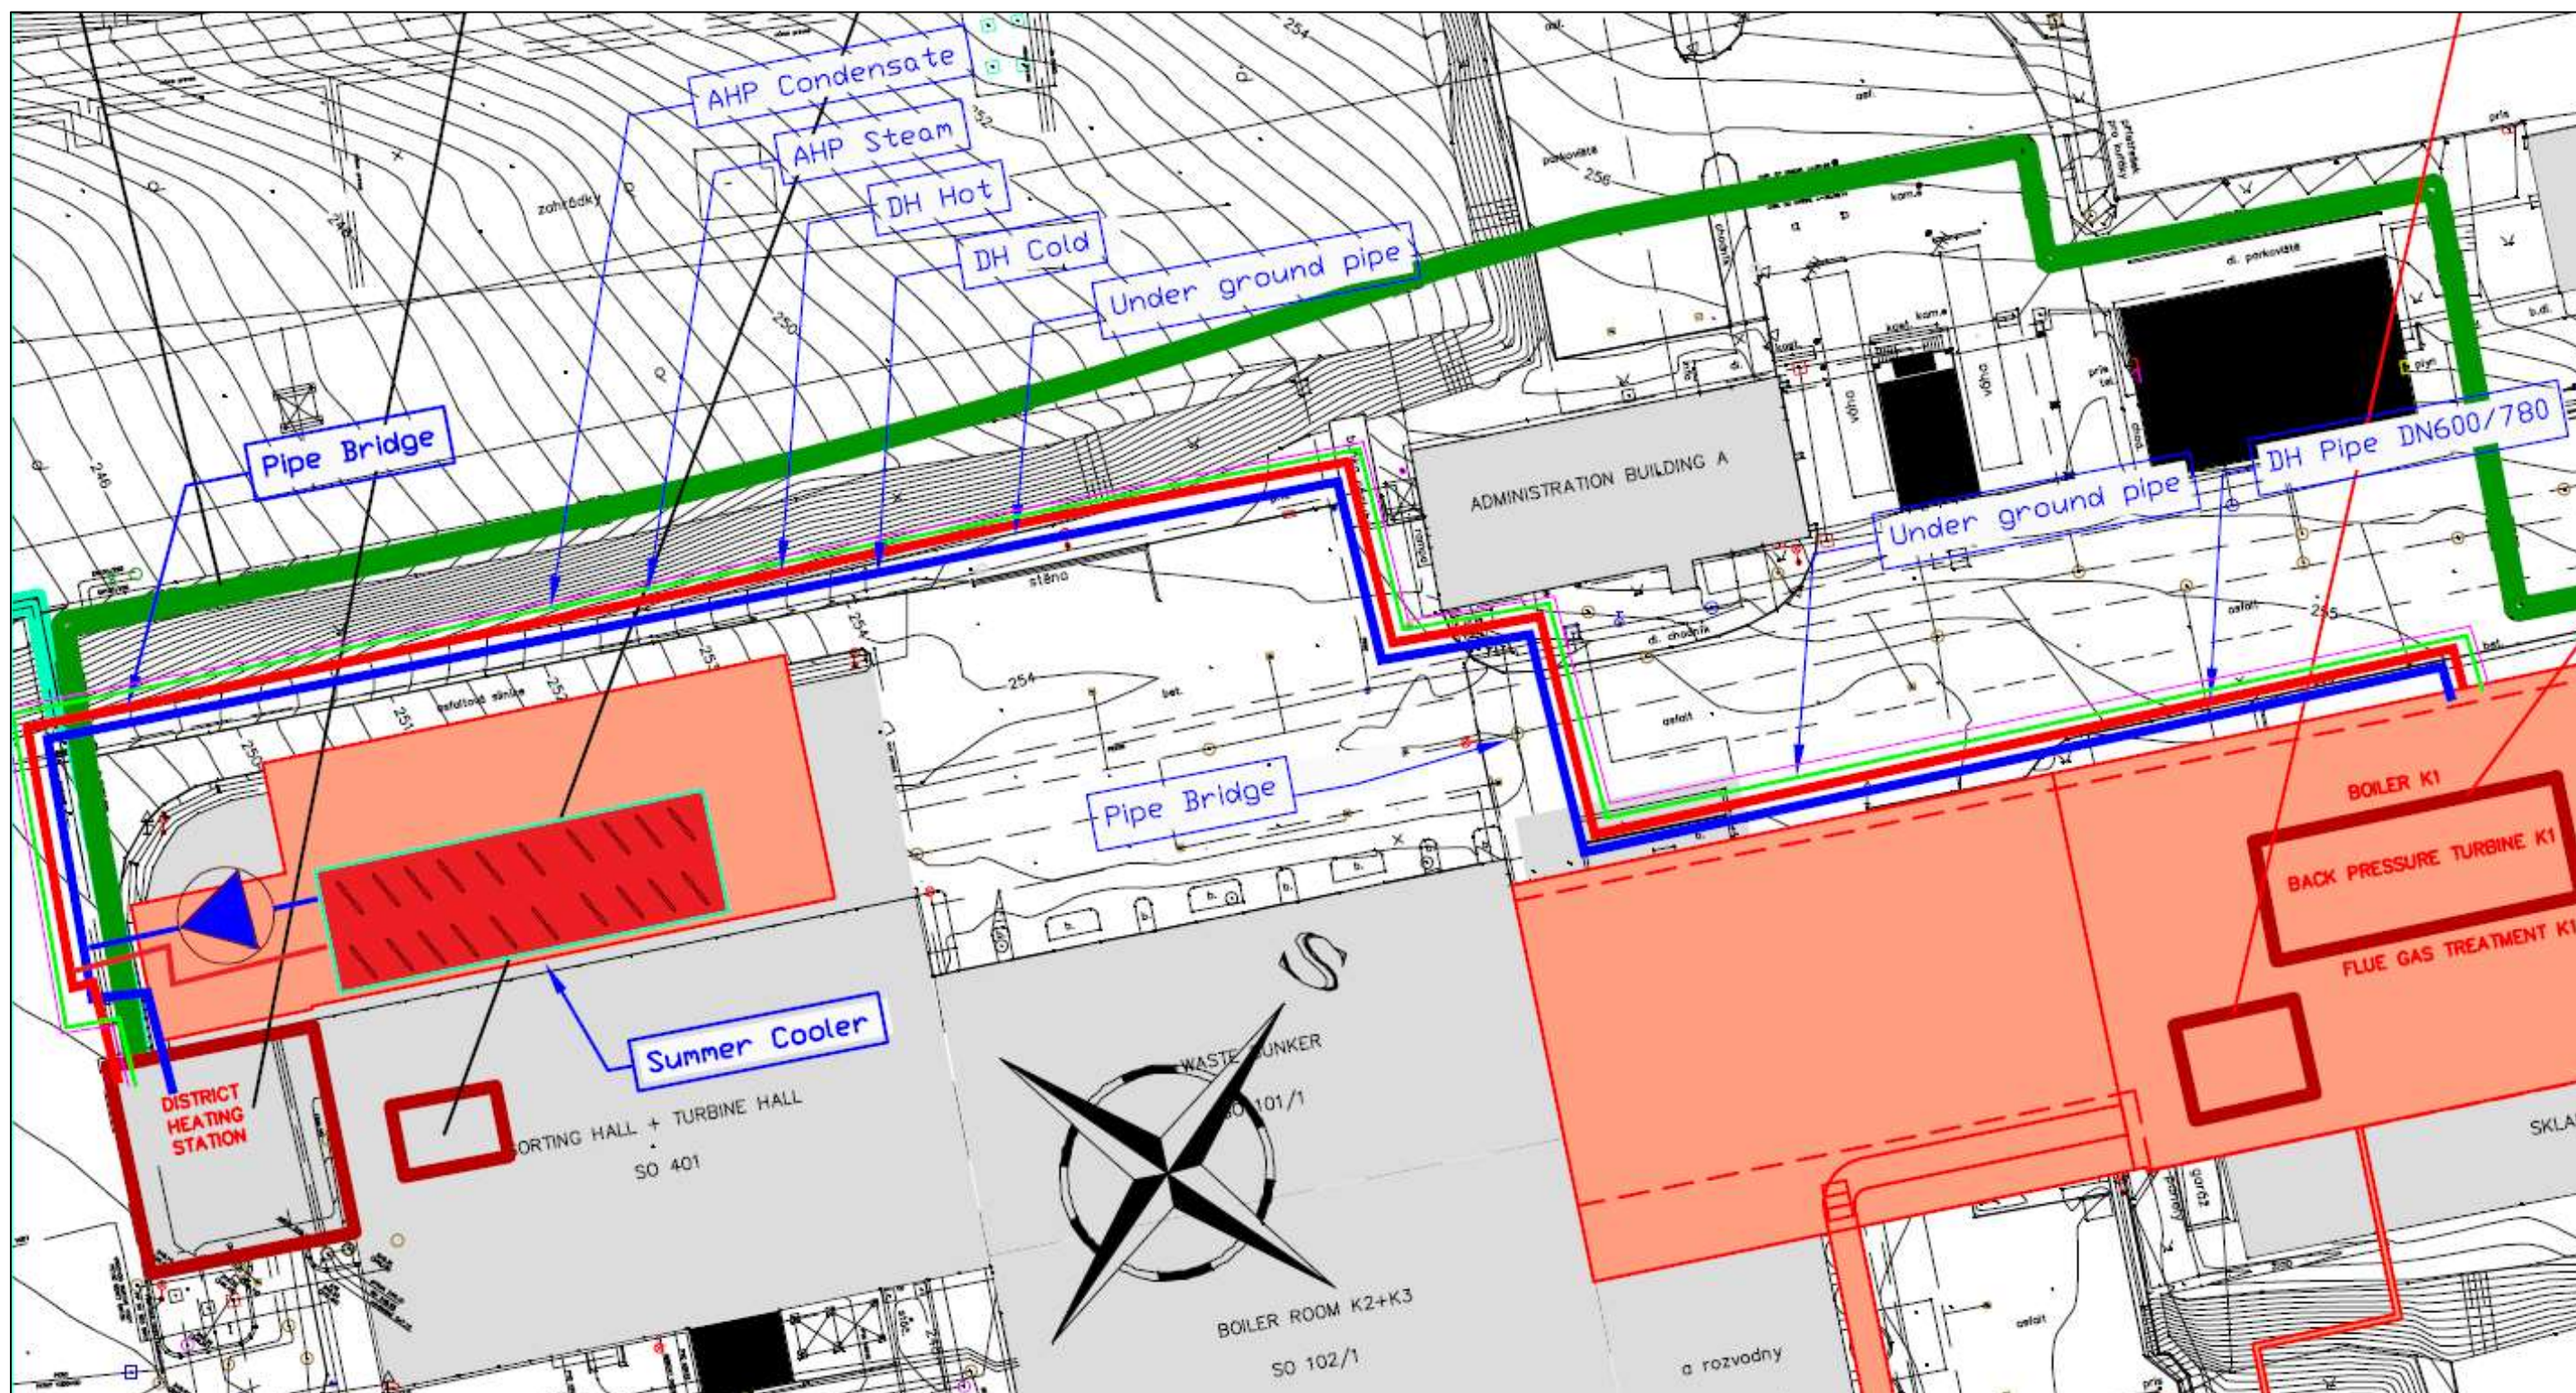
, Alternative A - Pipe routing between line K1 and existing DH building. "S" is towards the north
